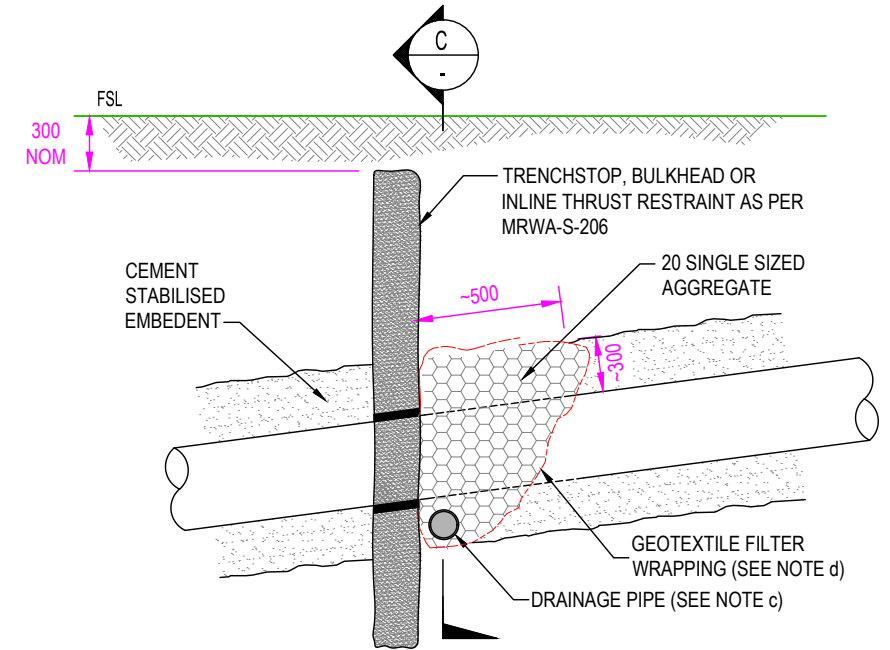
B: TRENCHSTOP WITH DRAIN (SECTION)
